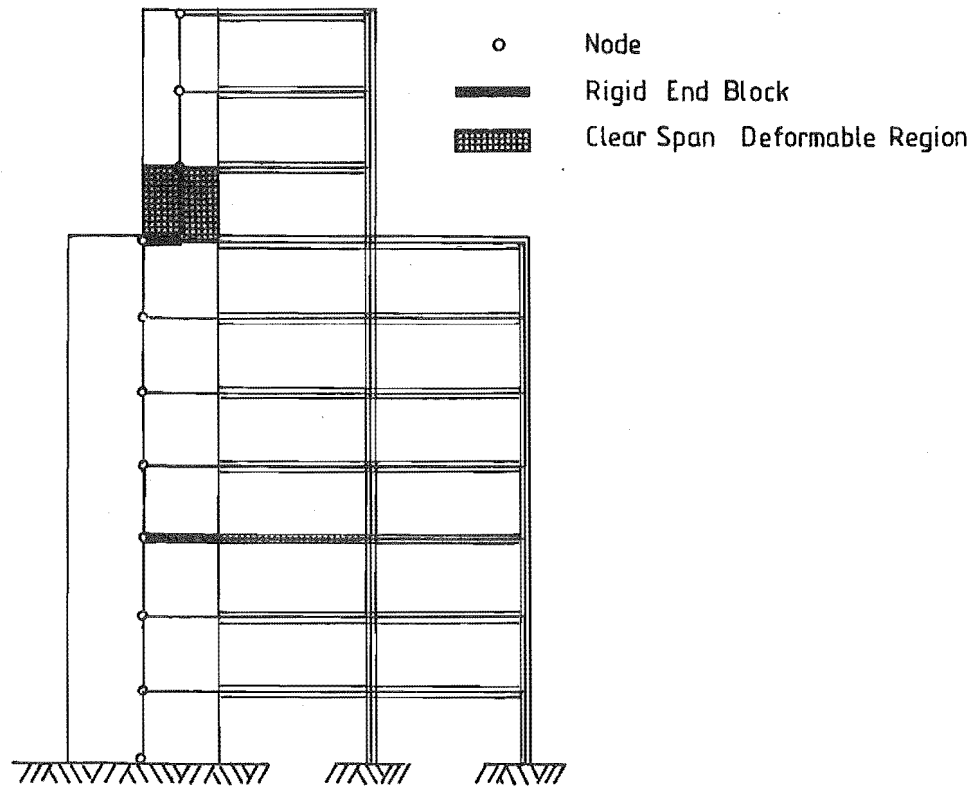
LINE ELEMENT IDEALIZATION TO STRUCTURAL FRAME-WALL ASSEMBLAGE
